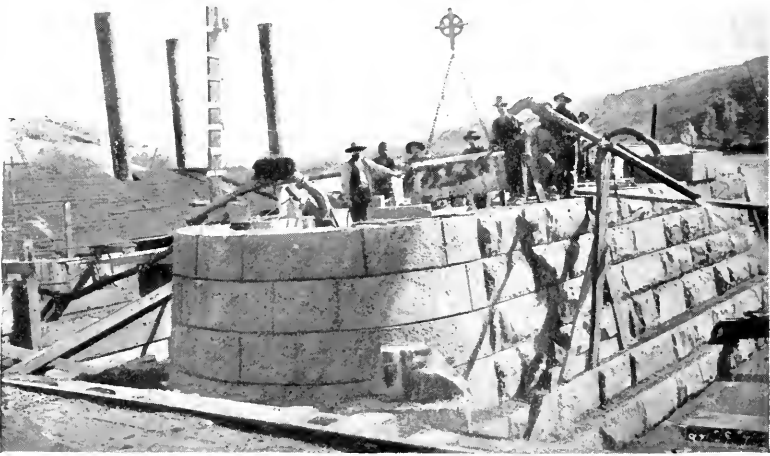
COMPRESSED AIR IN BRIDGE WORK. BUILDING PIER OF CANTILEVER BRIDGE AT THE NEEDLES, CAL., ON A CAISSON SUNK 64 FEET BELOW WATER LEVEL.
